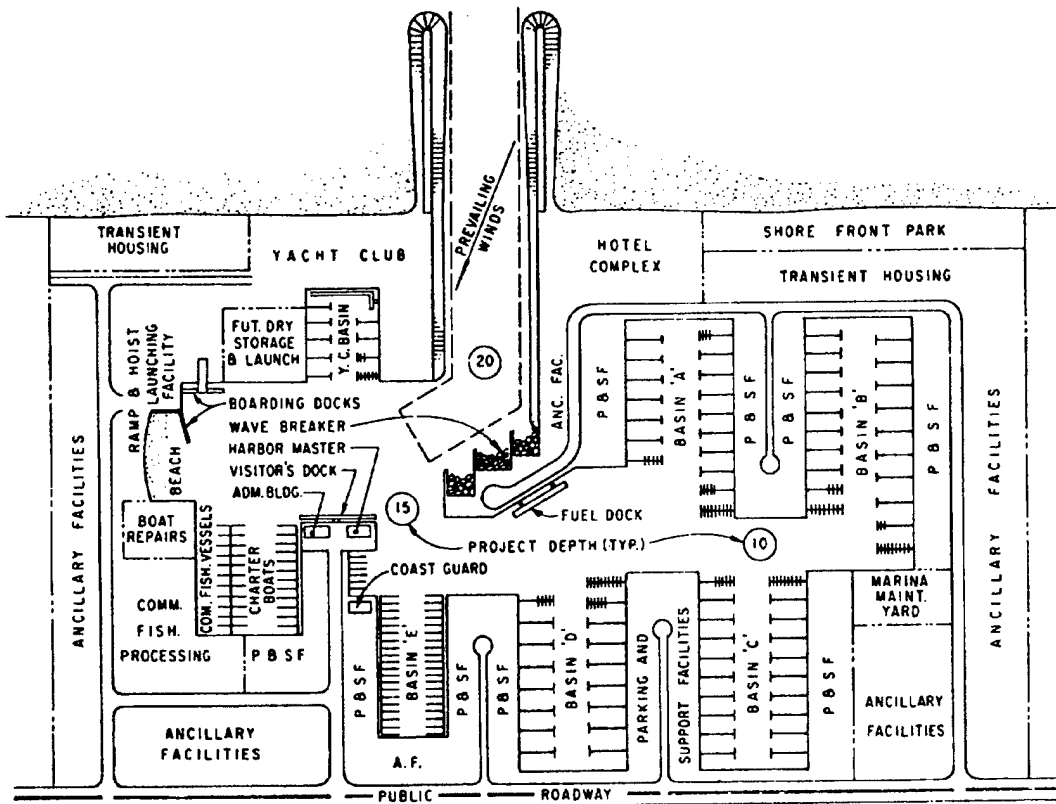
Schematic layout of a marina (for illustration only; not a recommended layout).
